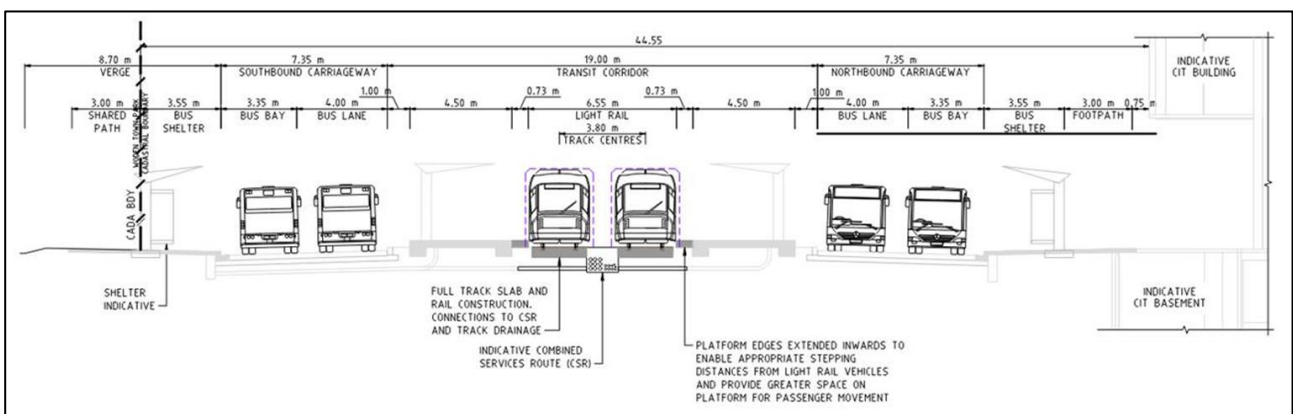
Callam Street Interchange Cross Section with Light Rail
